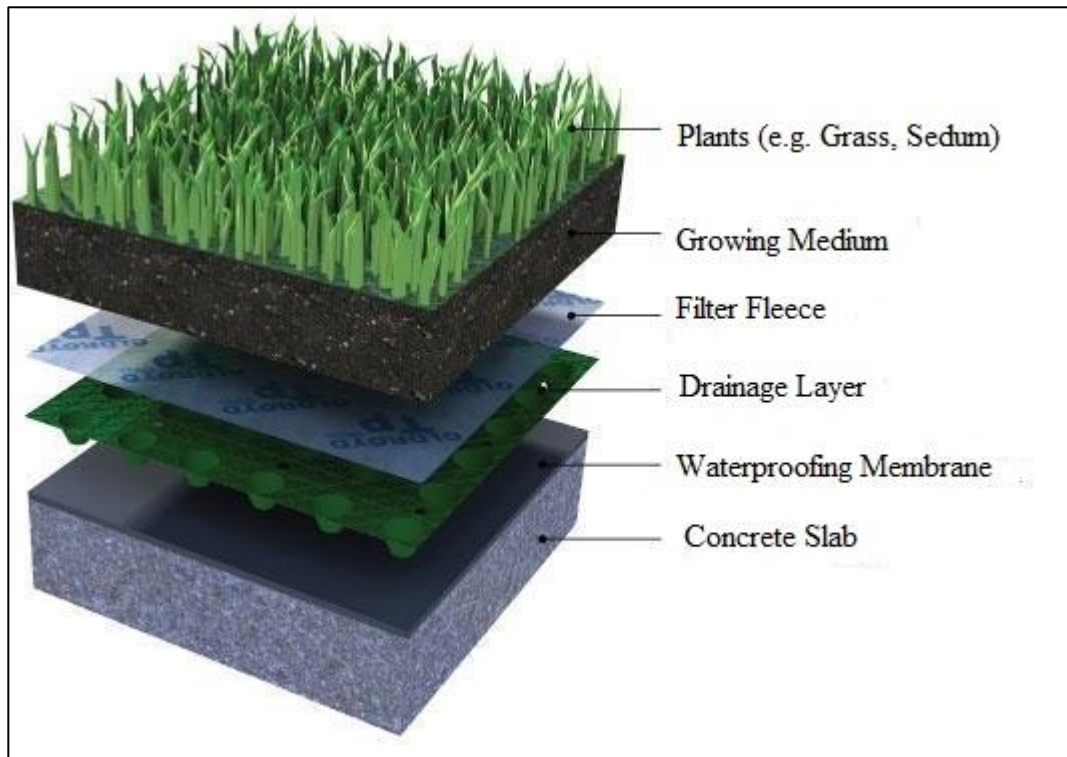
Cross Section of Common Green Roof System (Ref: www.roof-garden-guides.blogspot.com)
